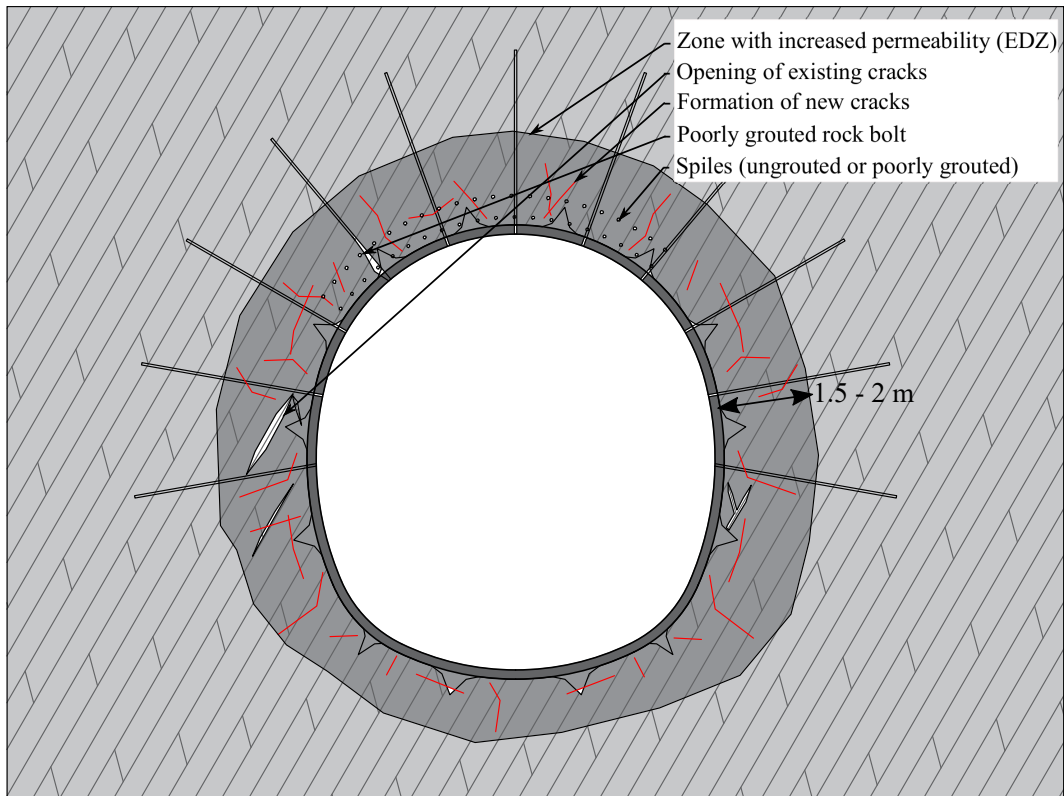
Geotechnical model of the excavation damage zone (EDZ)
